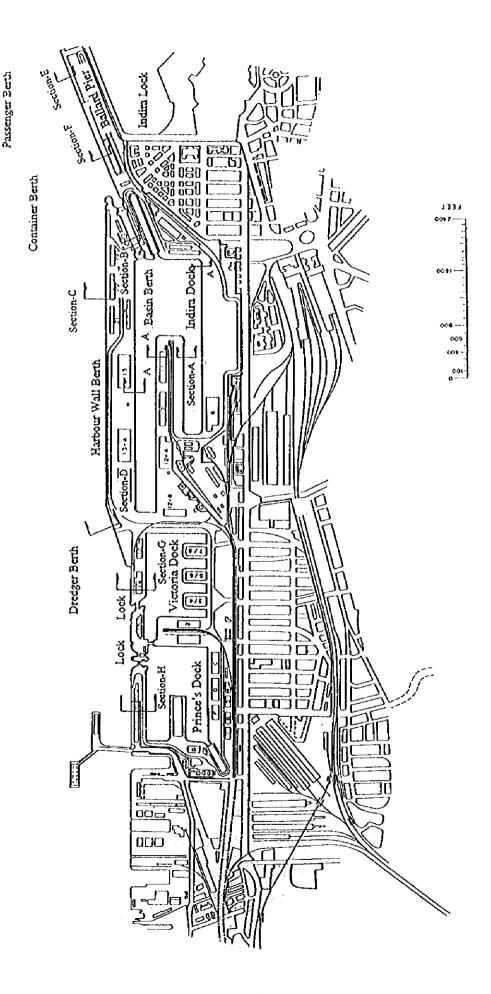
Plan of Dock Area in Central Mumbai Port
